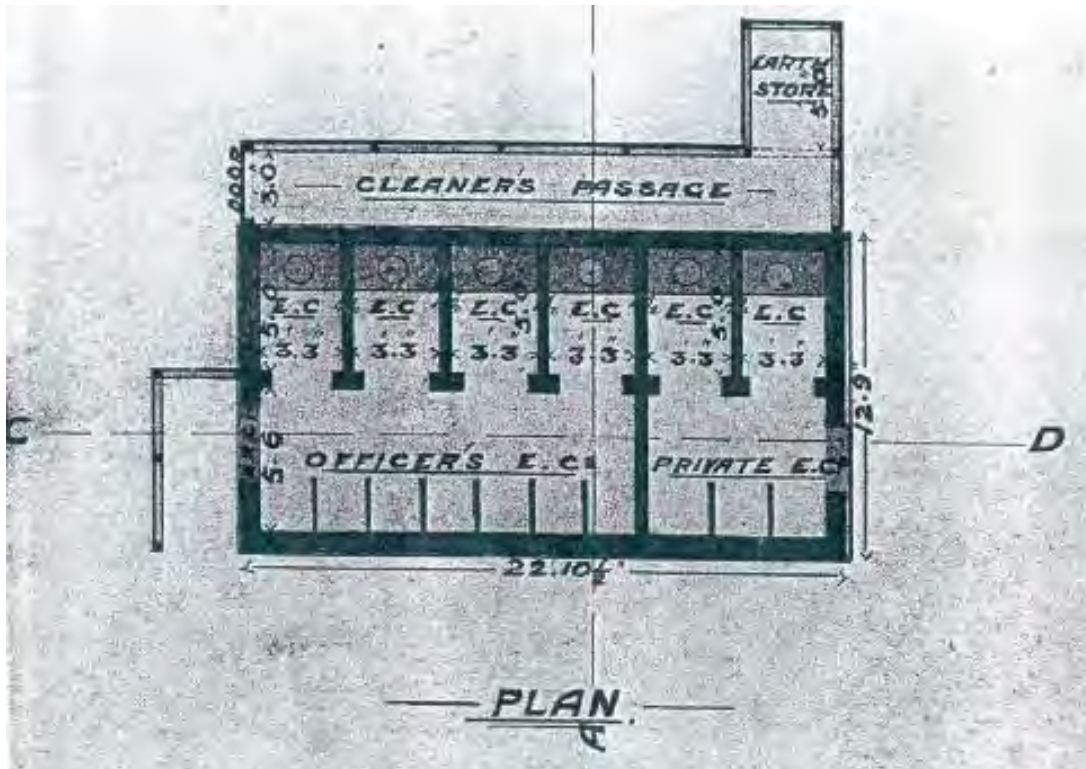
Layout of the original toilet block/ outhouse originally for the CME Building. Later adapted and altered to incorporate with the Scientific Services Buildings No. 1 and No. 2 (Source: CMP 1997)
